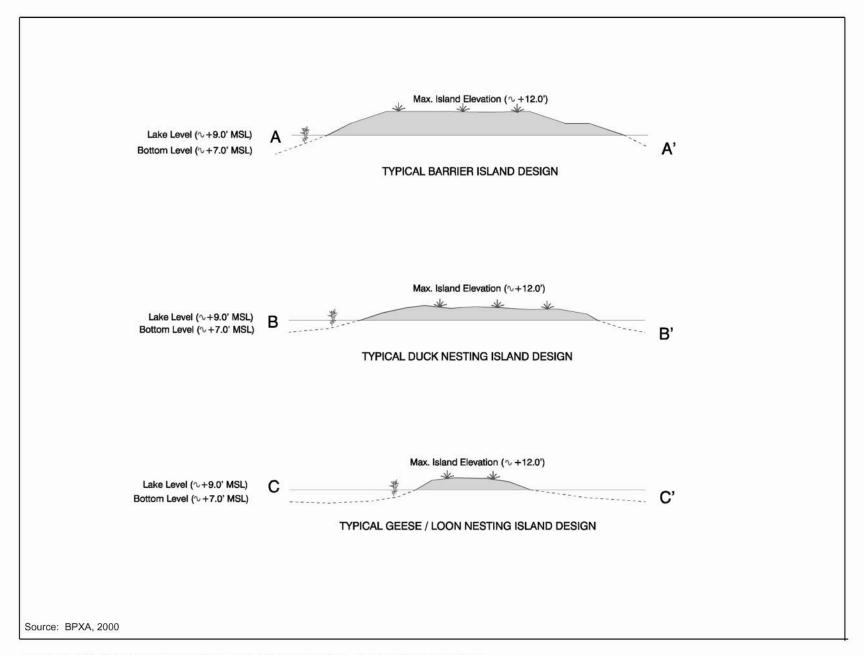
Duck Island Mine Site - Proposed Restoration - Typical Cross-Sections
